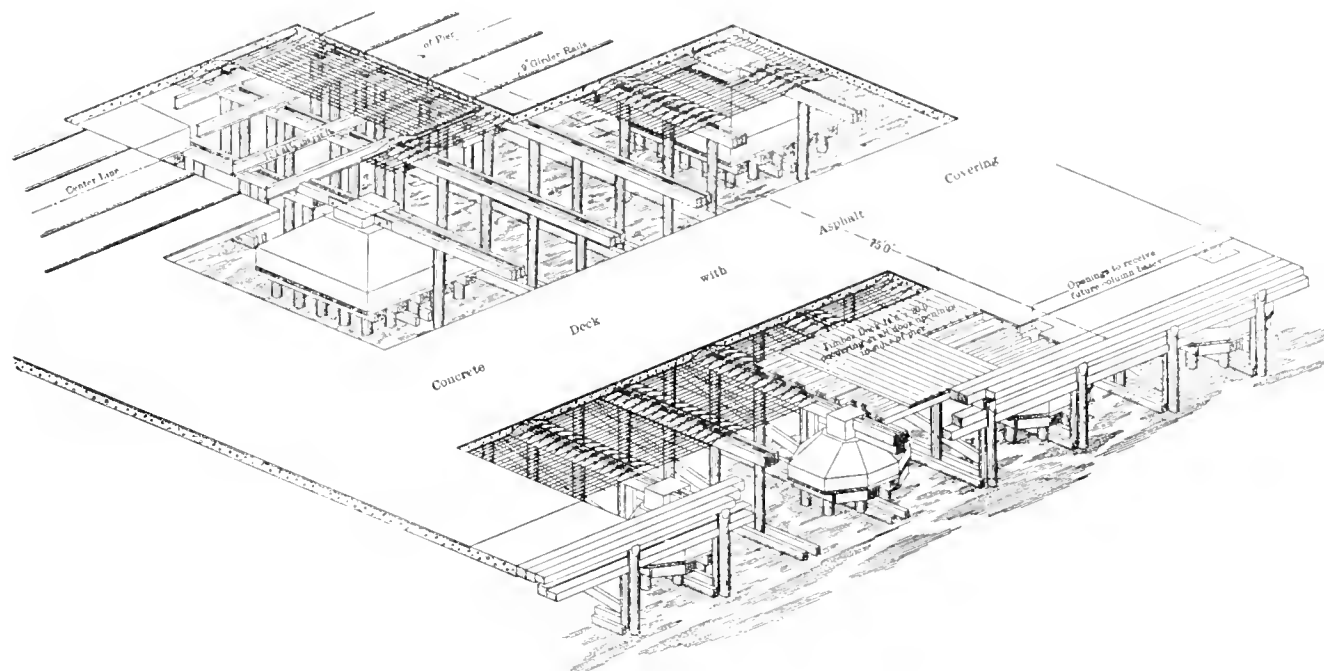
Showing Placing of Steel Reinforcement, Pedestals, Track Beams, Etc., New York Pier Construction.
